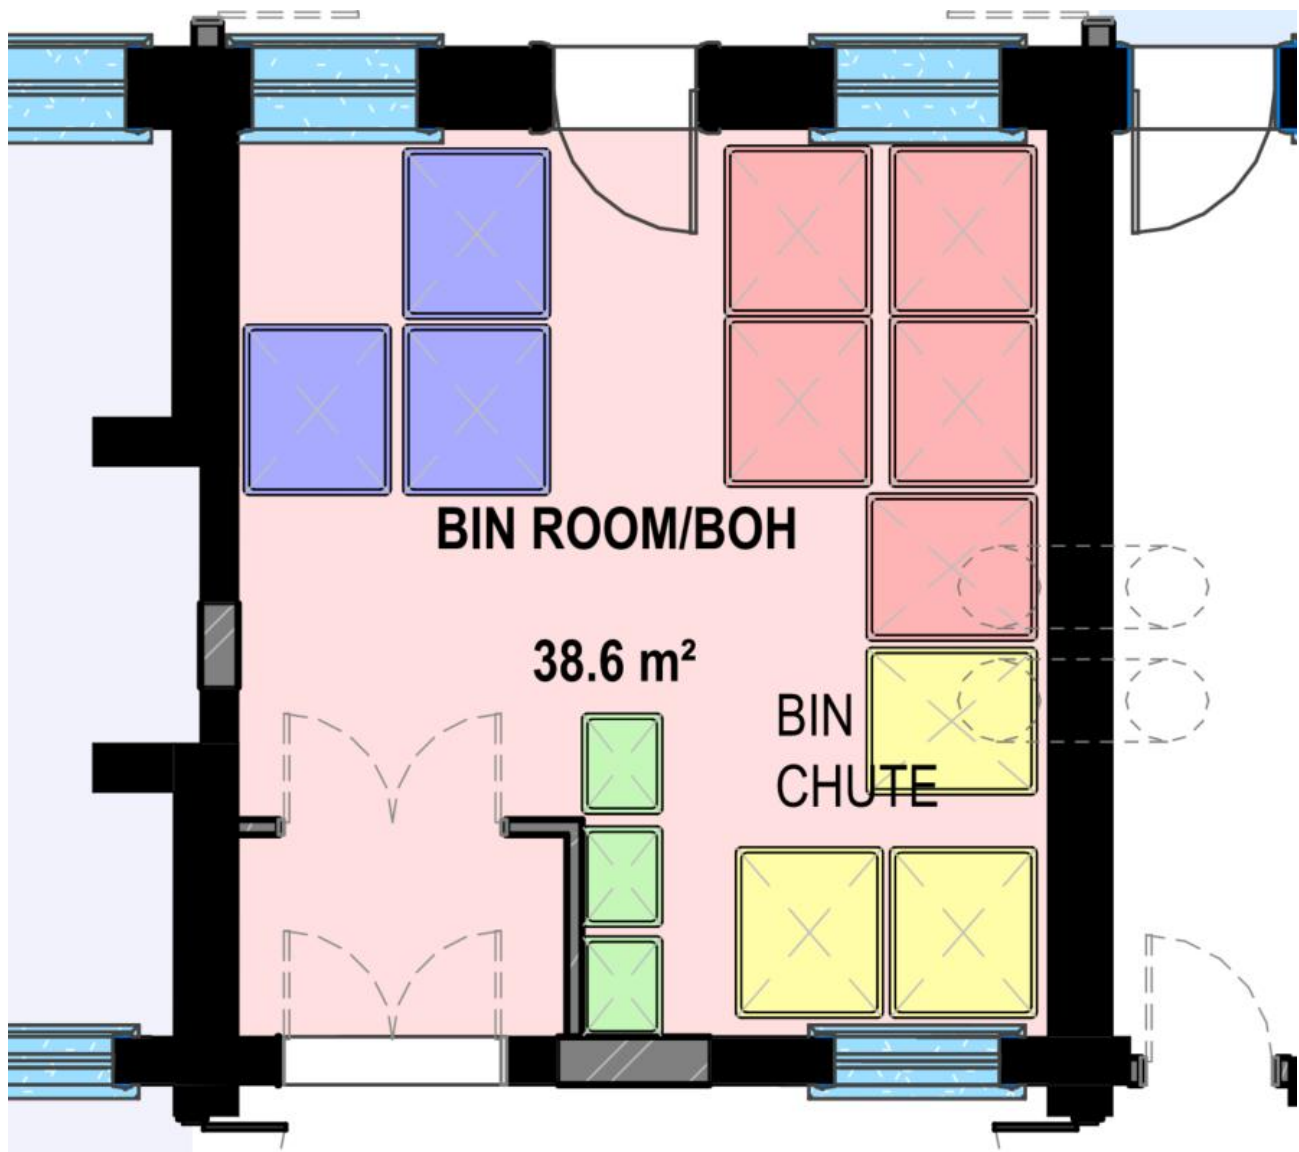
Bin Room Layout - Building A (Heritage - Commercial, Café)
